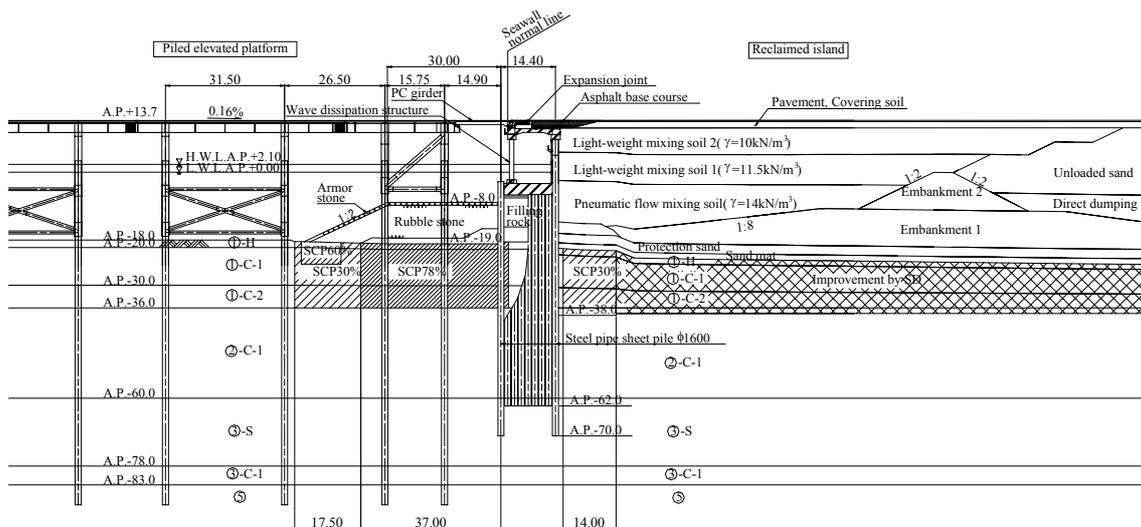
Cross section of steel pipe sheet-pile cellular seawall
